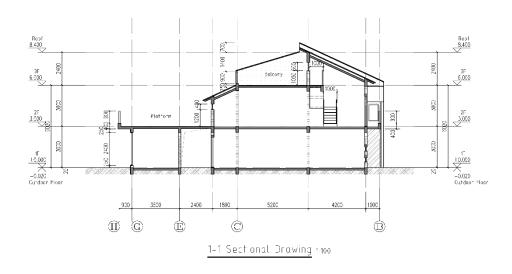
1-1 Sectional Drawing (Drawn by the author)
